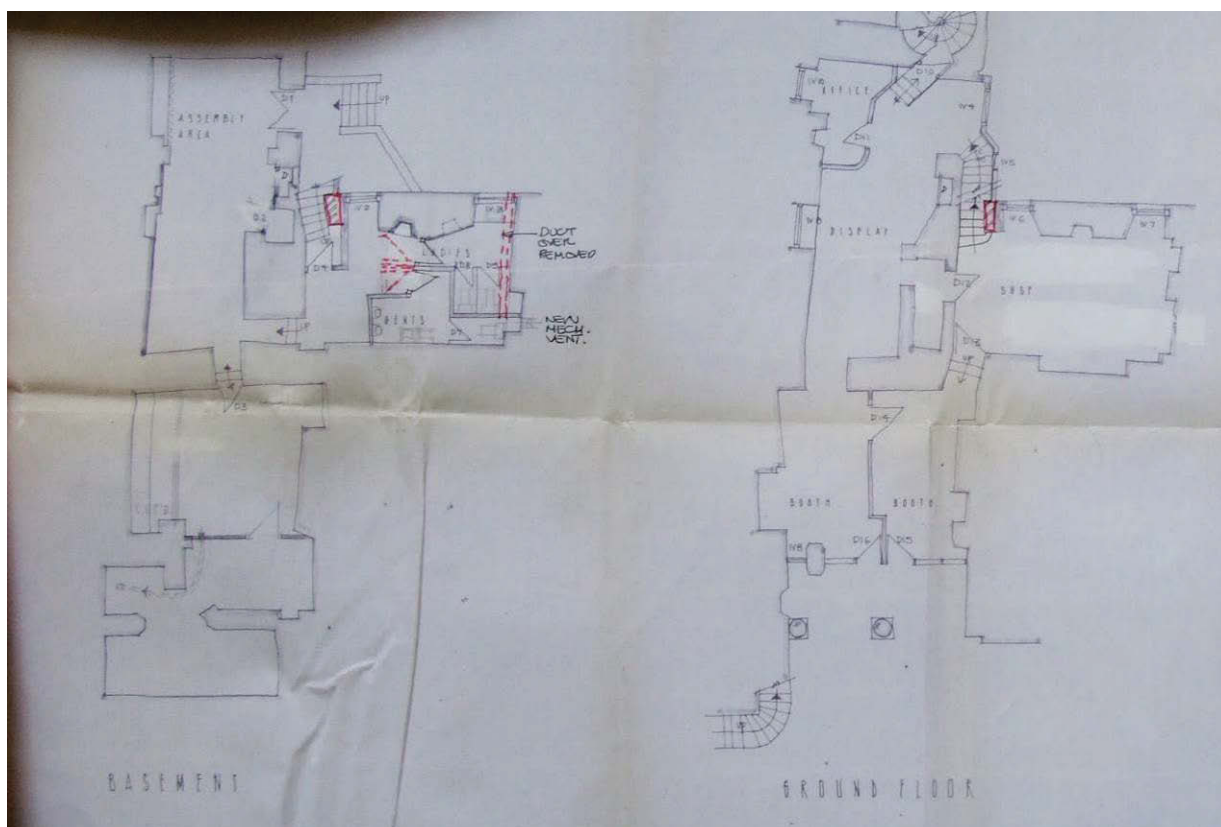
Plans showing basement and first floor amendments to the 1978 scheme, Robert Hurd & Ptns, granted warrant in May 1980. There is an engineer's detail for the pier, showing engineering brick, concrete and steel. City of Edinburgh plan store
